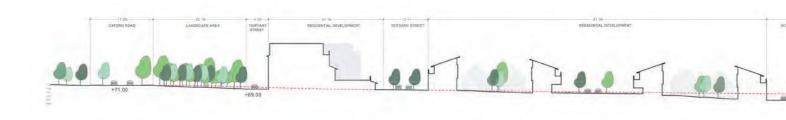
Site Section 02- West to East, cutting through the school's playing fields
